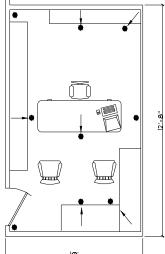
Sketch of the layout of measurement points when obstructions are encountered.
